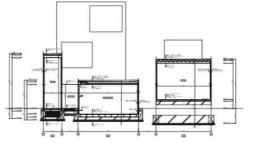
Section and elevation, Moriyama house, SANAA (2005) • Source: El Croquis
